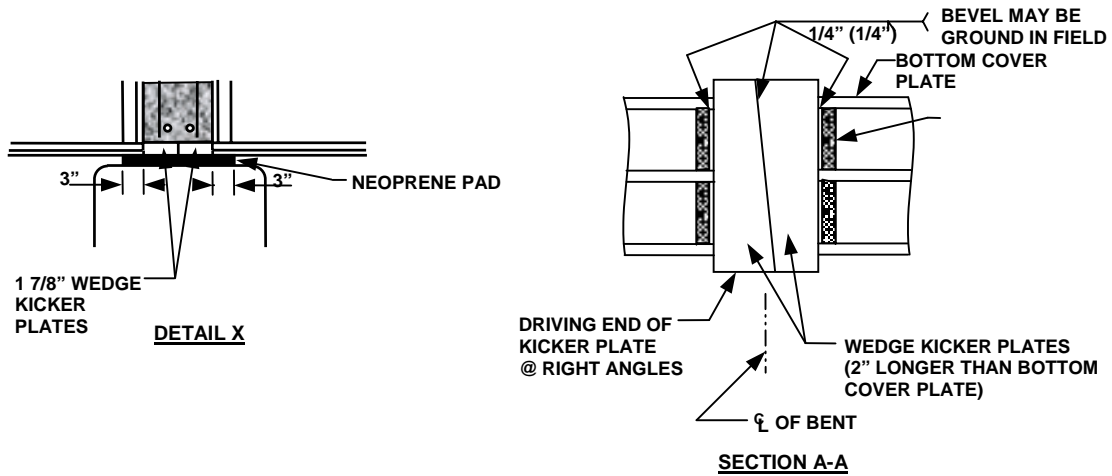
Wedge Kicker Plate Details for Dupont Access Road (TDOT 2002)
